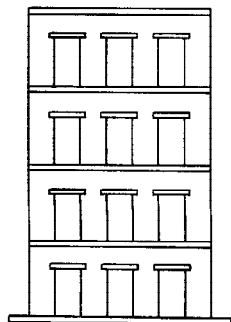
Typical example of a slender masonry wall with regularly distributed voids and solids.
